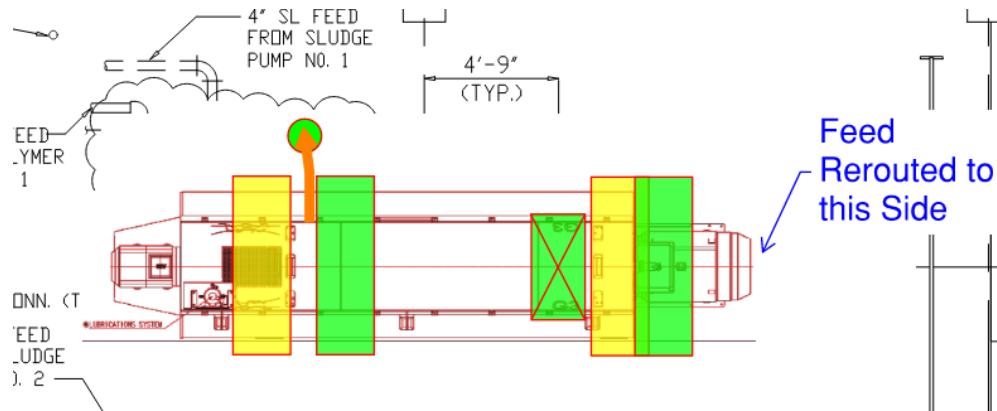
Alfa Laval Centrifuges Plan Zoomed
